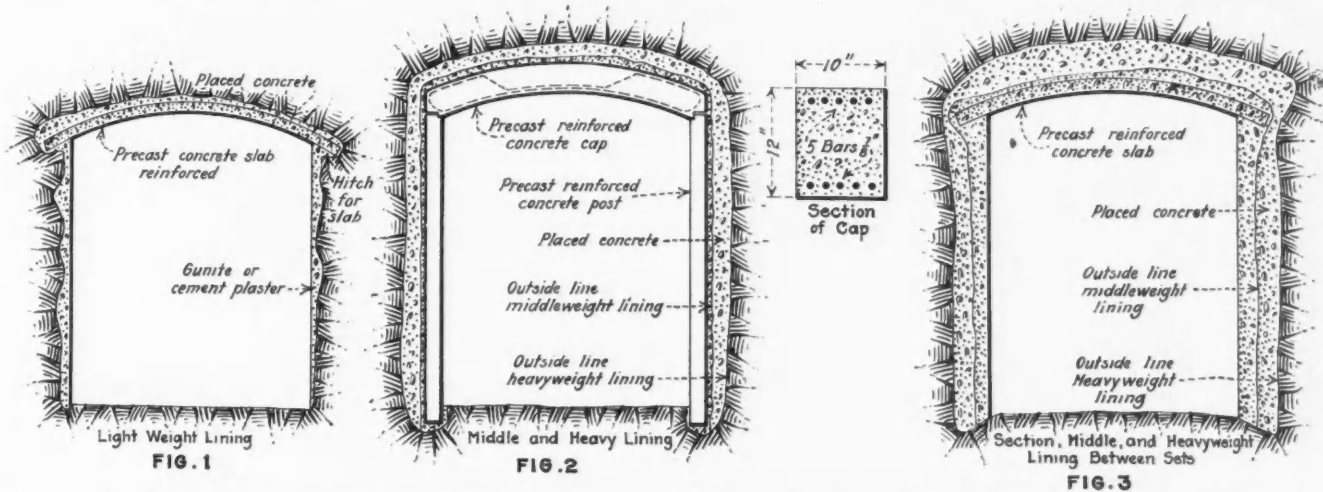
Light-weight tunnel lining. Fig. 2—Middle- and heavy-weight tunnel lining. Fig. 3—Section showing lining between middle- and heavy-weight tunnel sets
